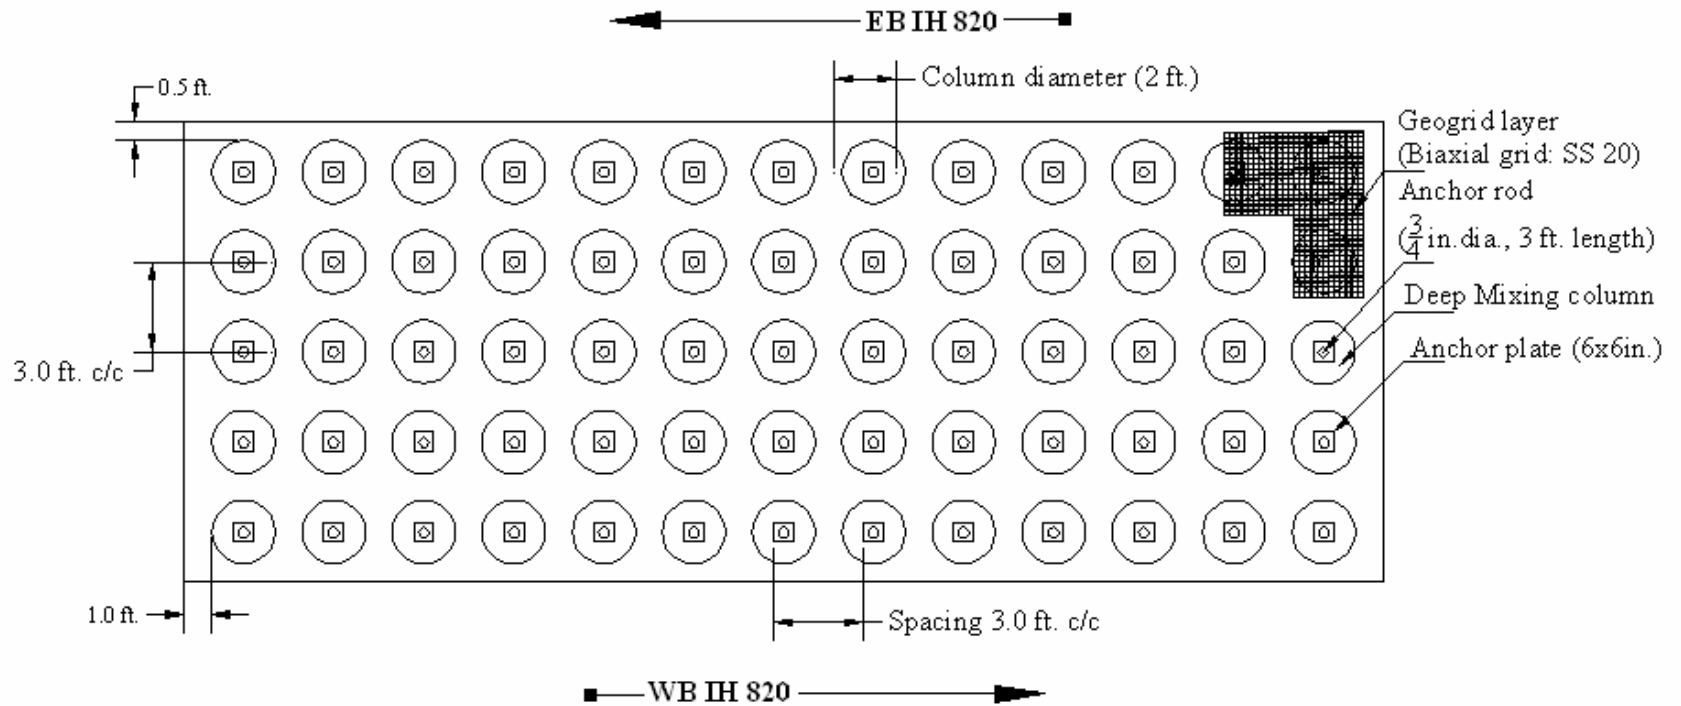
Plan view of DSM column layout of test site 2 (15 ft X 40 ft)
